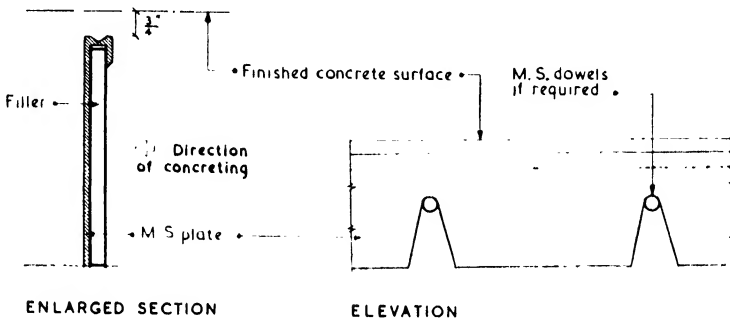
INSTALLING BAR FOR PREMOLDED FILLER.
